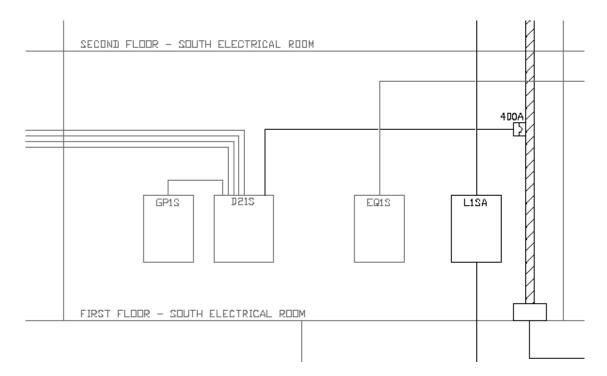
Riser Diagram of South Electrical Room – Proposed System
